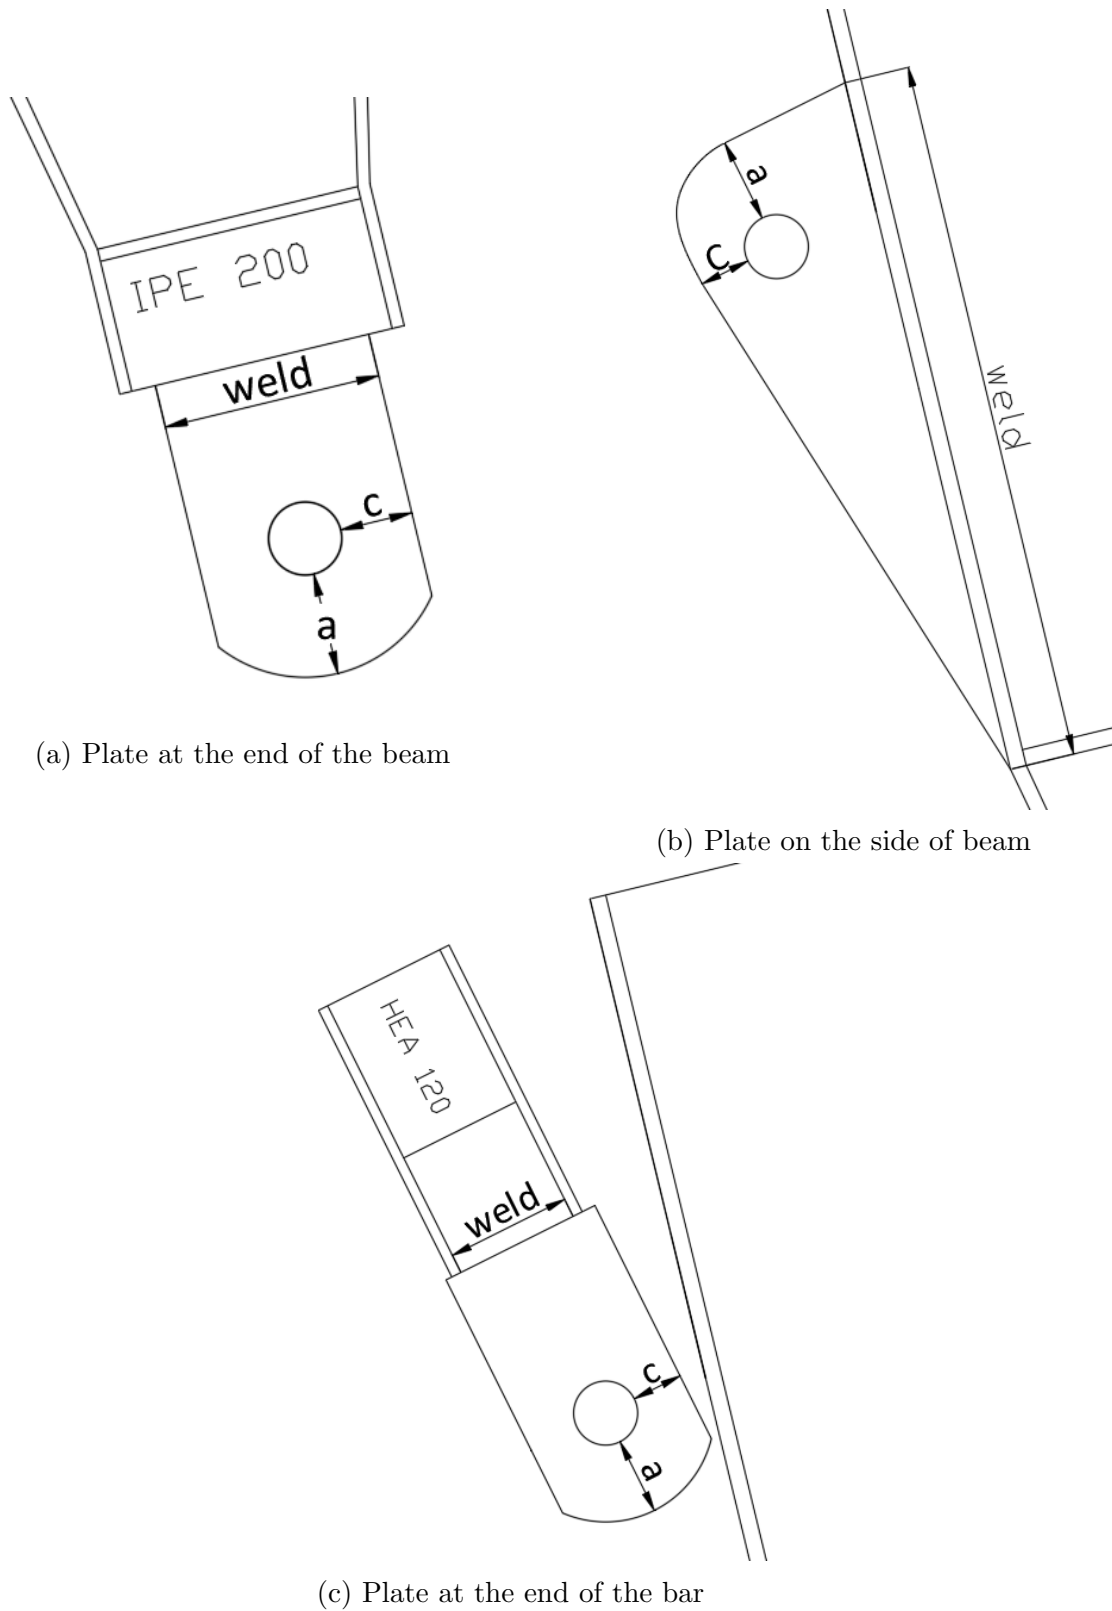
Drawings of proposed connection design between 4B7, 4D3 and top ring
